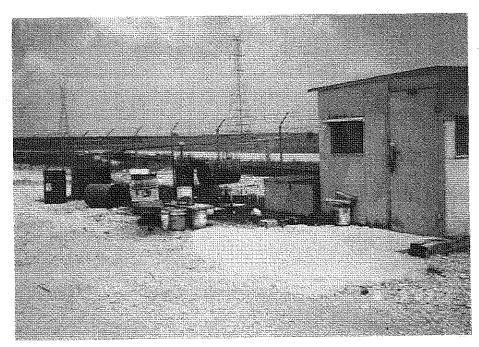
East view of Waste Pickle Liquor Loading Pad (SWMU 44). Note stains on building wall and concrete pad.
